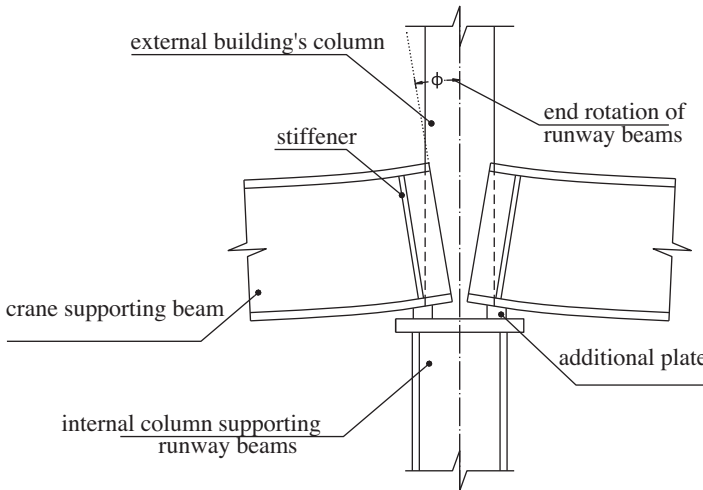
Supporting positions of crane supporting beams. Surge connections
